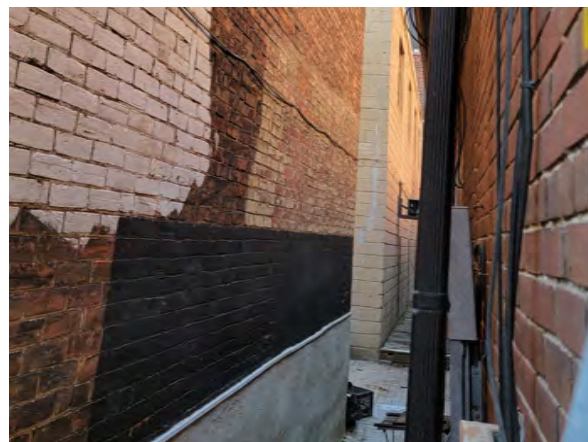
Painted brick and parking in poor condition (ERA, 2022).
